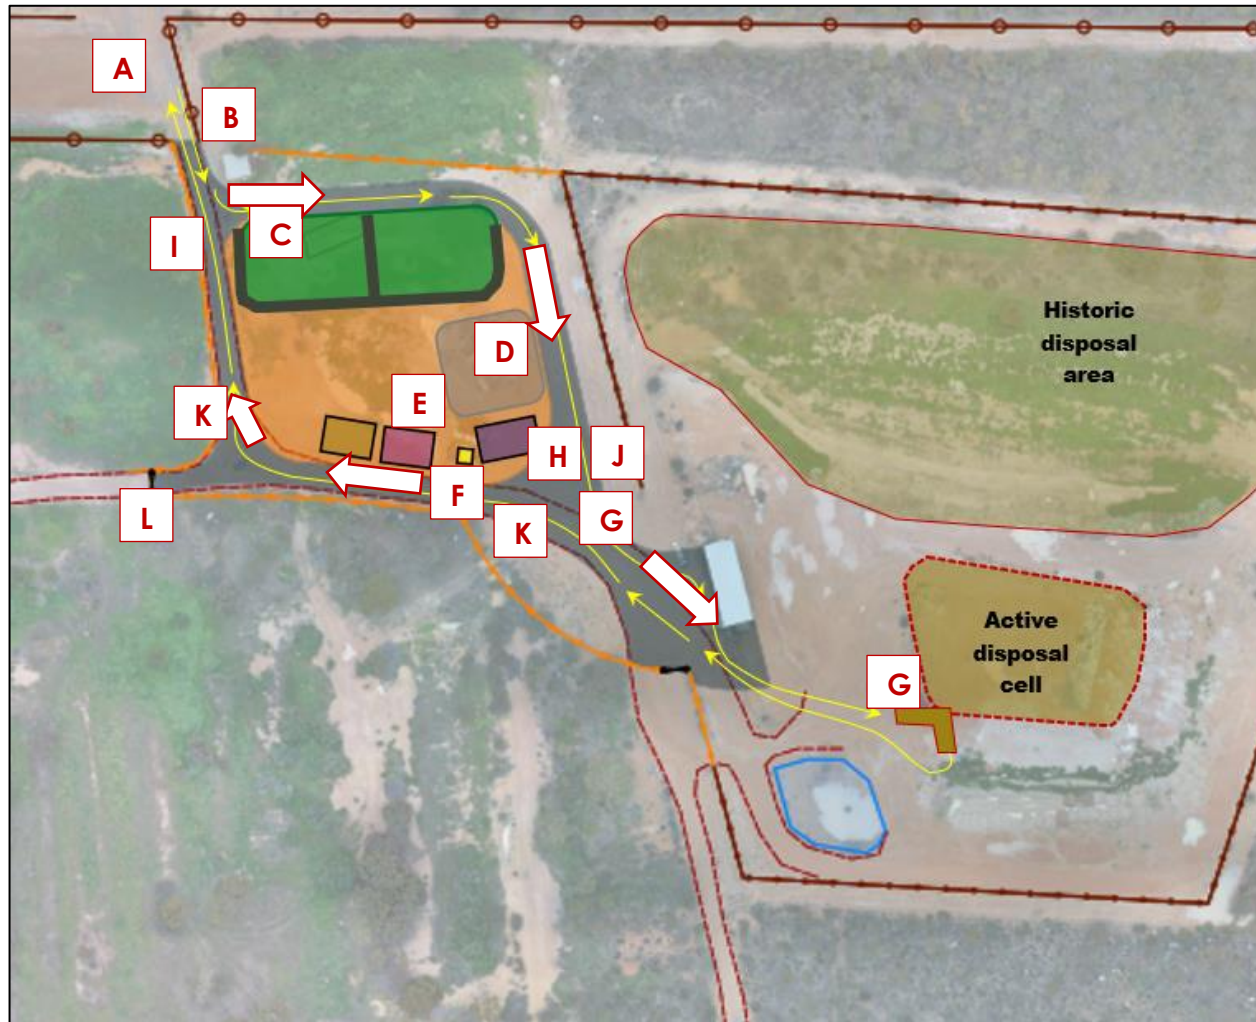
Nyabing Site Layout Plan – Proposed signs
